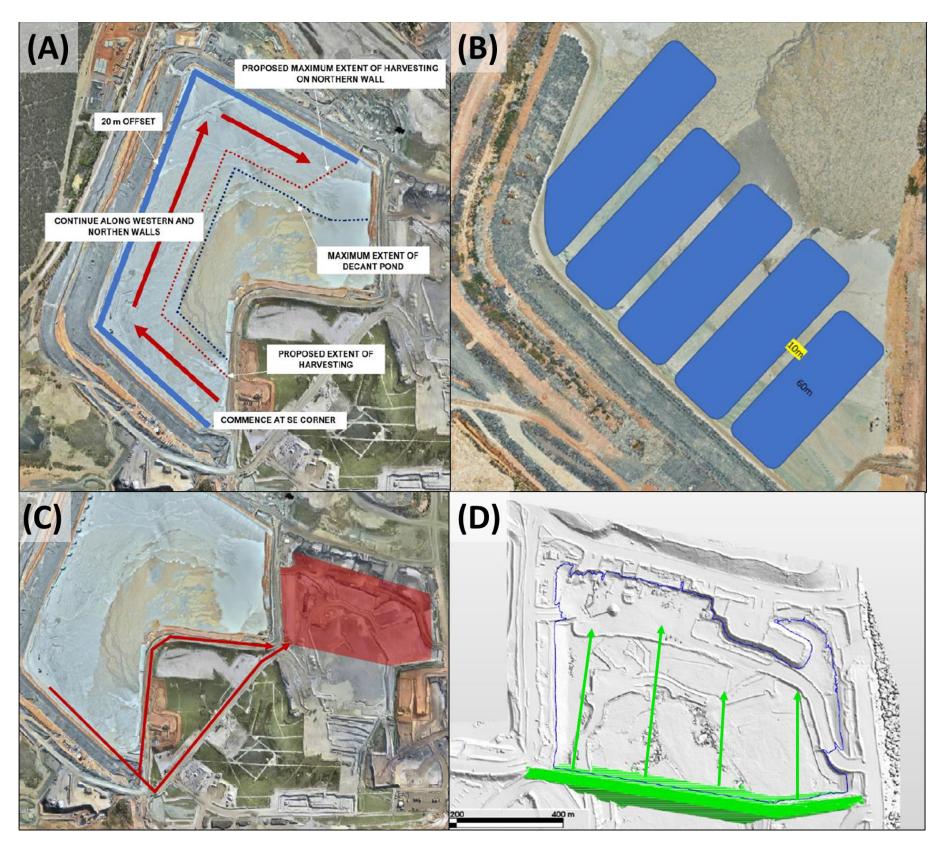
(A) Excavation sequence at TSF2, including separation distance from decant pond, (B) Conceptual layout of excavation strips, (C) Authorised area for tailings deposition at TSF1 (red shade), (D) Layout of causeway at TSF1 (green) and extent to tailings deposition (blue)
